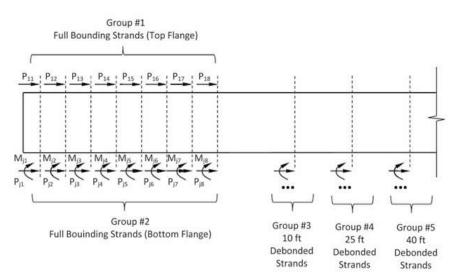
Prestressing force model in bridge longitudinal direction for drop-in girders (1ft =305 mm)
